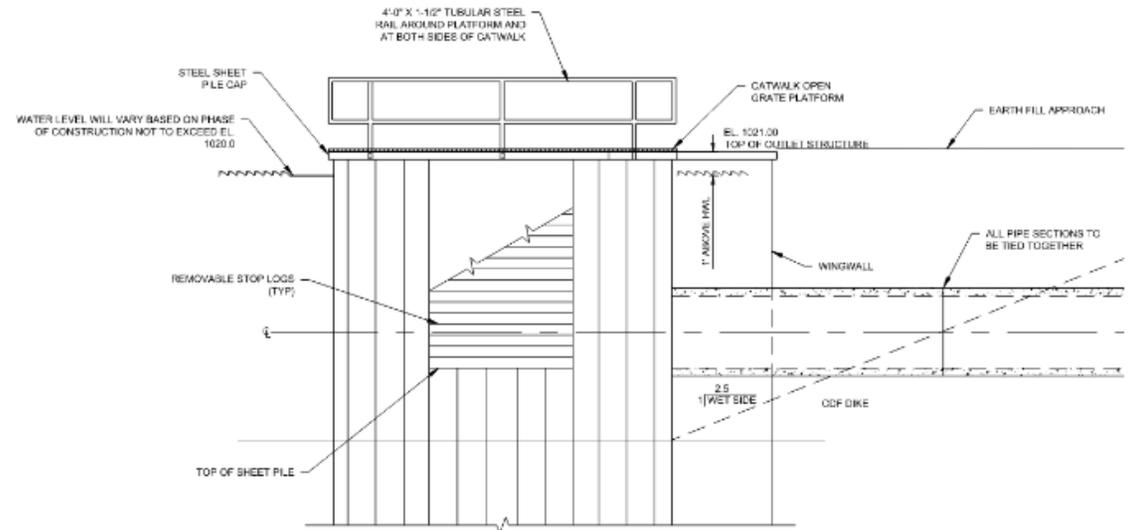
CDF Sheet Pile Outlet Structure – Elevation
